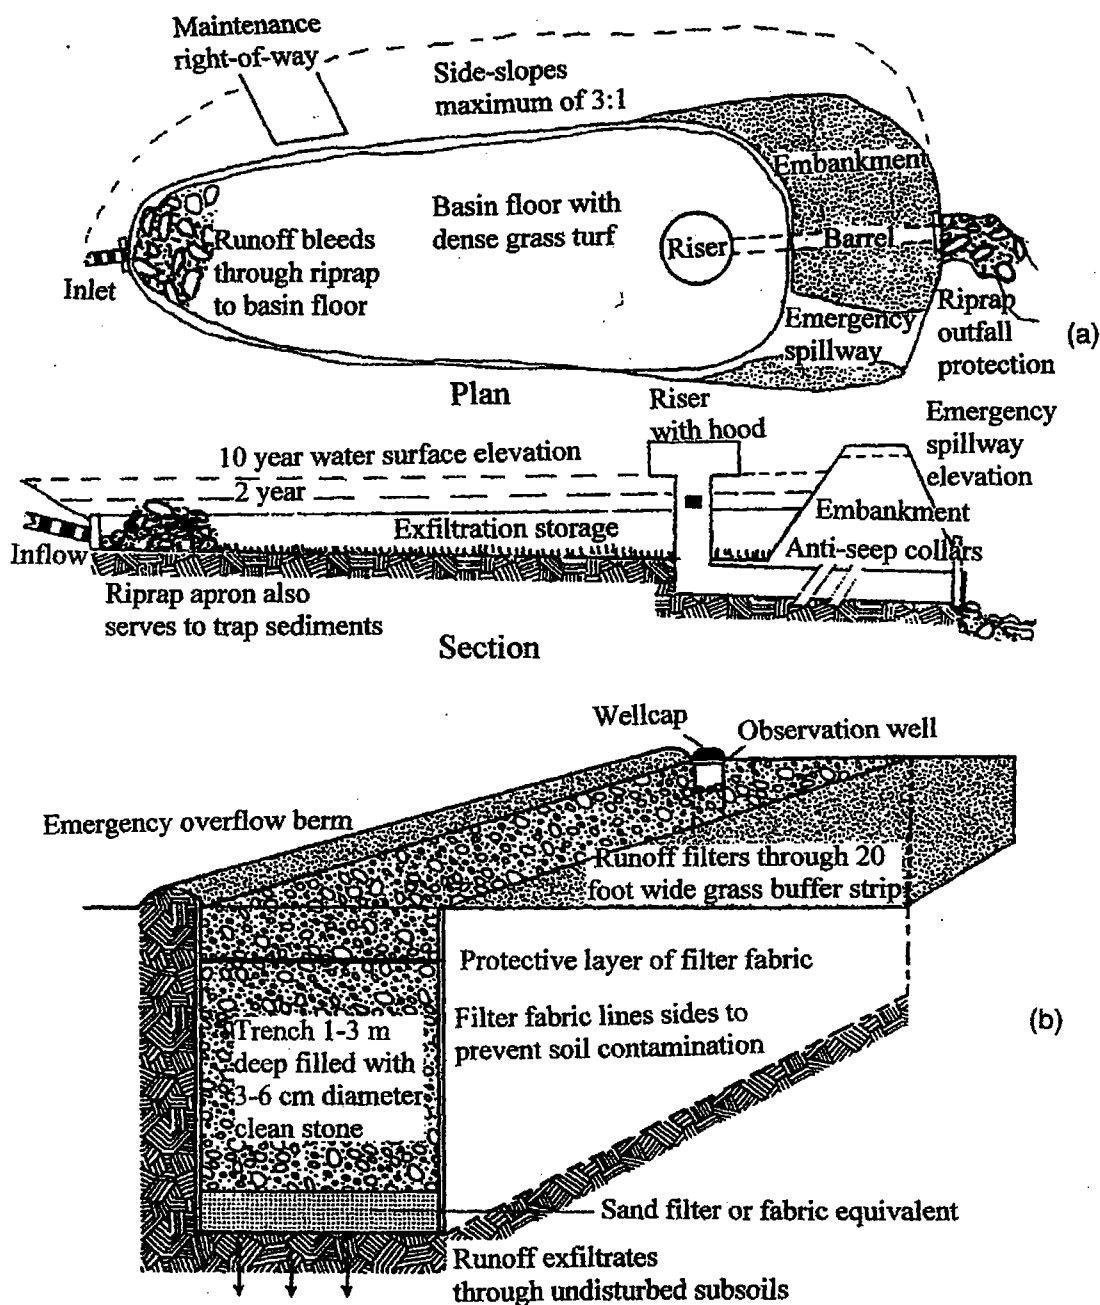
Infiltration Facilities for Control of Stormwater Runoff: (a) infiltration basin that has a vertical riser to control the depth of runoff (riser height designed to control 2-year and 10-year storms); (b) basin infiltration trench design.
